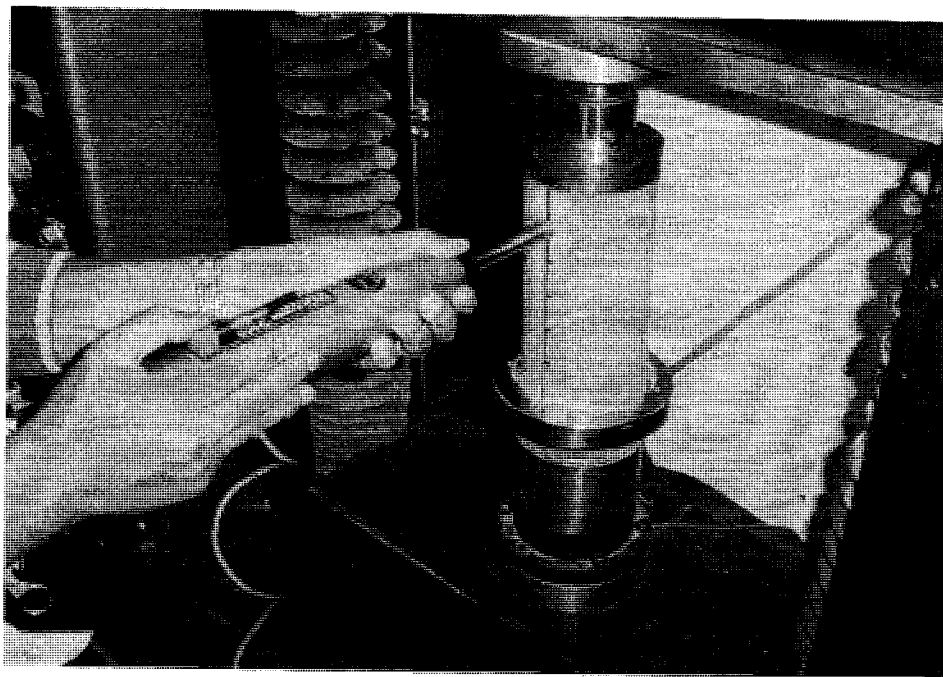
Rebound Hammer Testing on Concrete (Buddhawanna, 2003).
